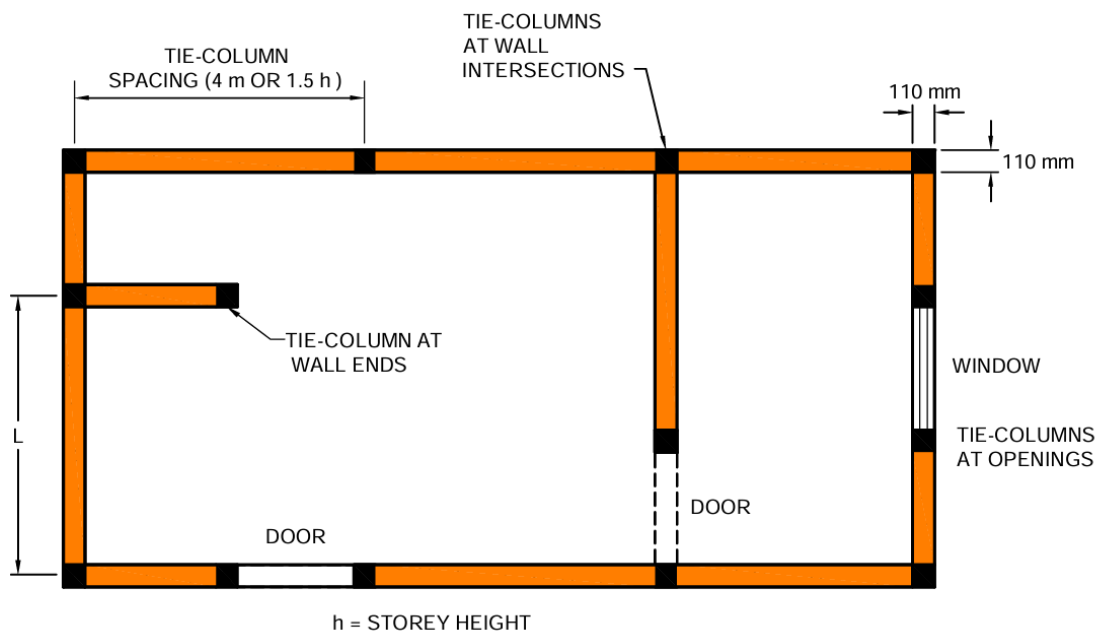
TYPICAL PLAN ILLUSTRATING THE PLACEMENT OF RC TIE COLUMNS
